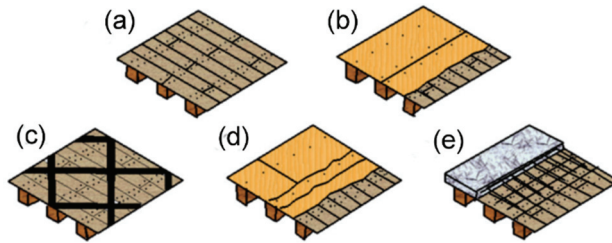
Different timber floor in-plane shear strengthening techniques: (a) existing simple layer of wood planks on the timber beams; (b) second layer of wood planks crossly arranged to the existing one and fixed by means of steel studs; (c) diagonal bracing of the existing wood planks by means of light steel plates or FRP laminae; (d) three layers of plywood panels glued on the existing wood planks; (e) a stud-connected reinforced concrete slab (redrawn from: [20])
